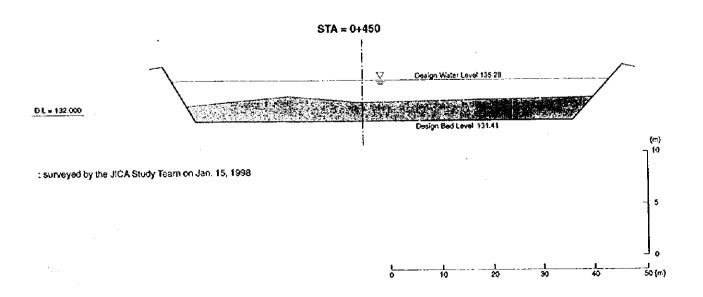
Cross Section of D.G. Khan Canal at Taunsa Barrage (1/4)
